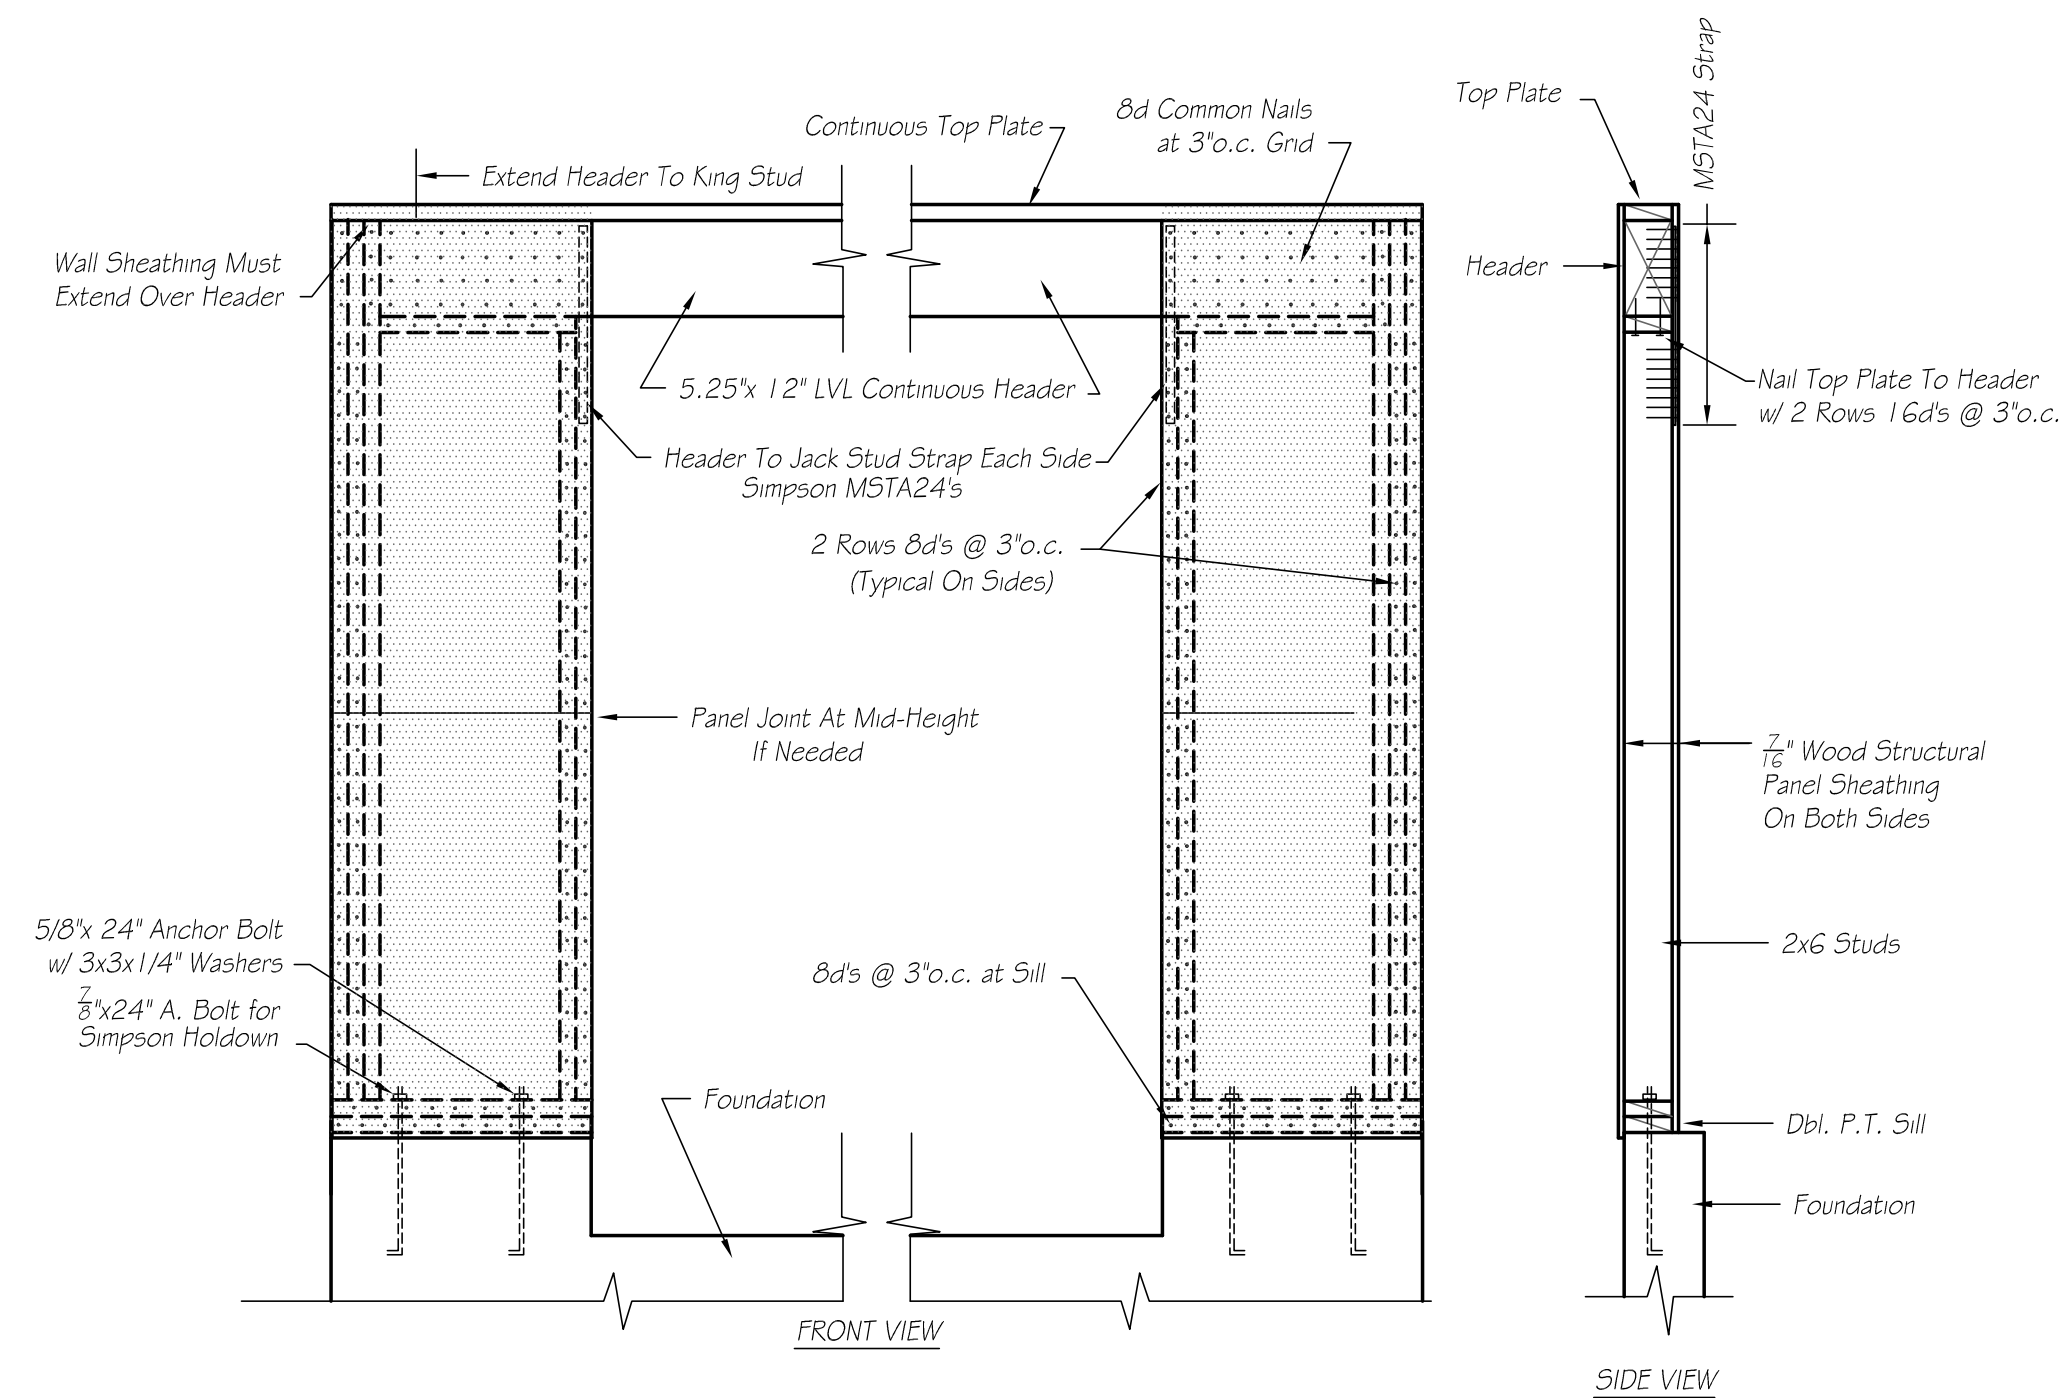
DETAIL - HOLD-DOWNS & ANCHOR BOLTS
